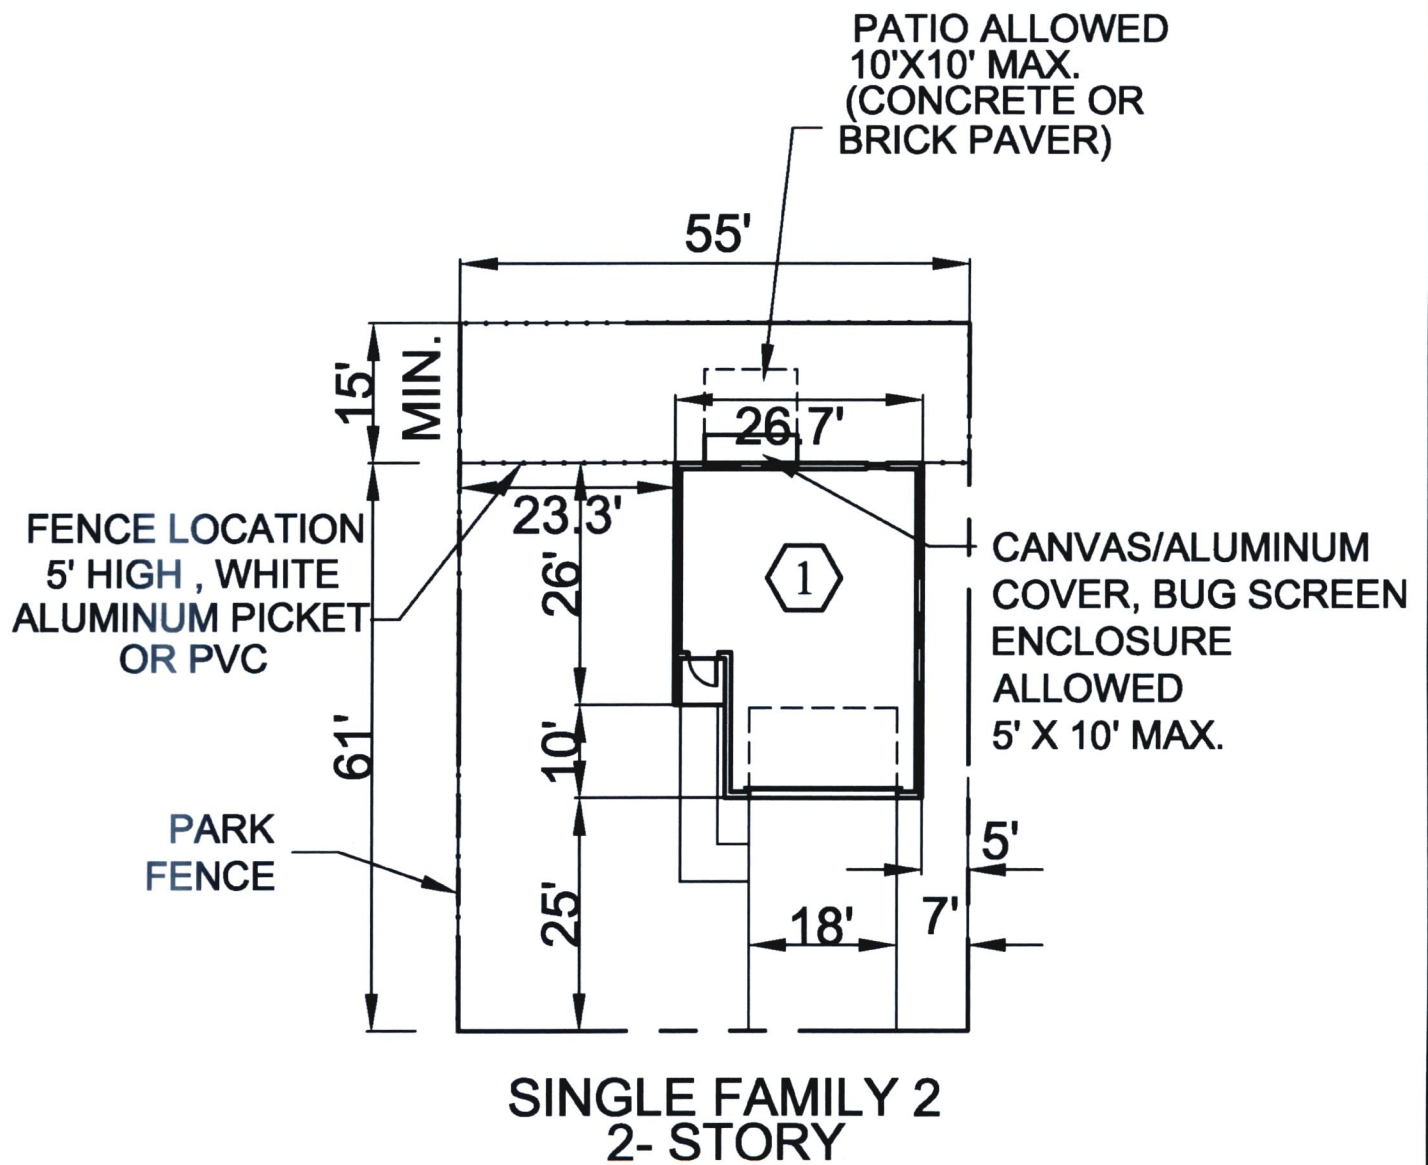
TYPICAL RESIDENTIAL PLAN TYPE D (LOTS 29 - 42)
